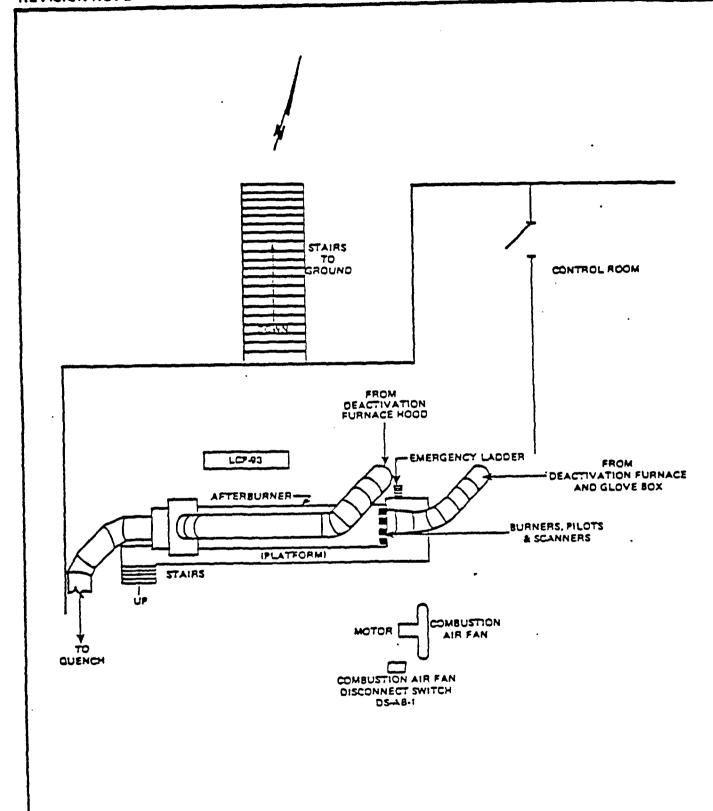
AFTERBURNER EQUIPMENT LOCATION (NORTHWEST ROOF CORNER)
